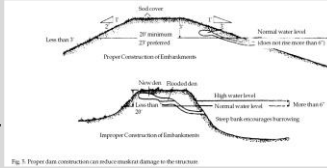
Proper dam construction can reduce muskrat damage to the structure.
